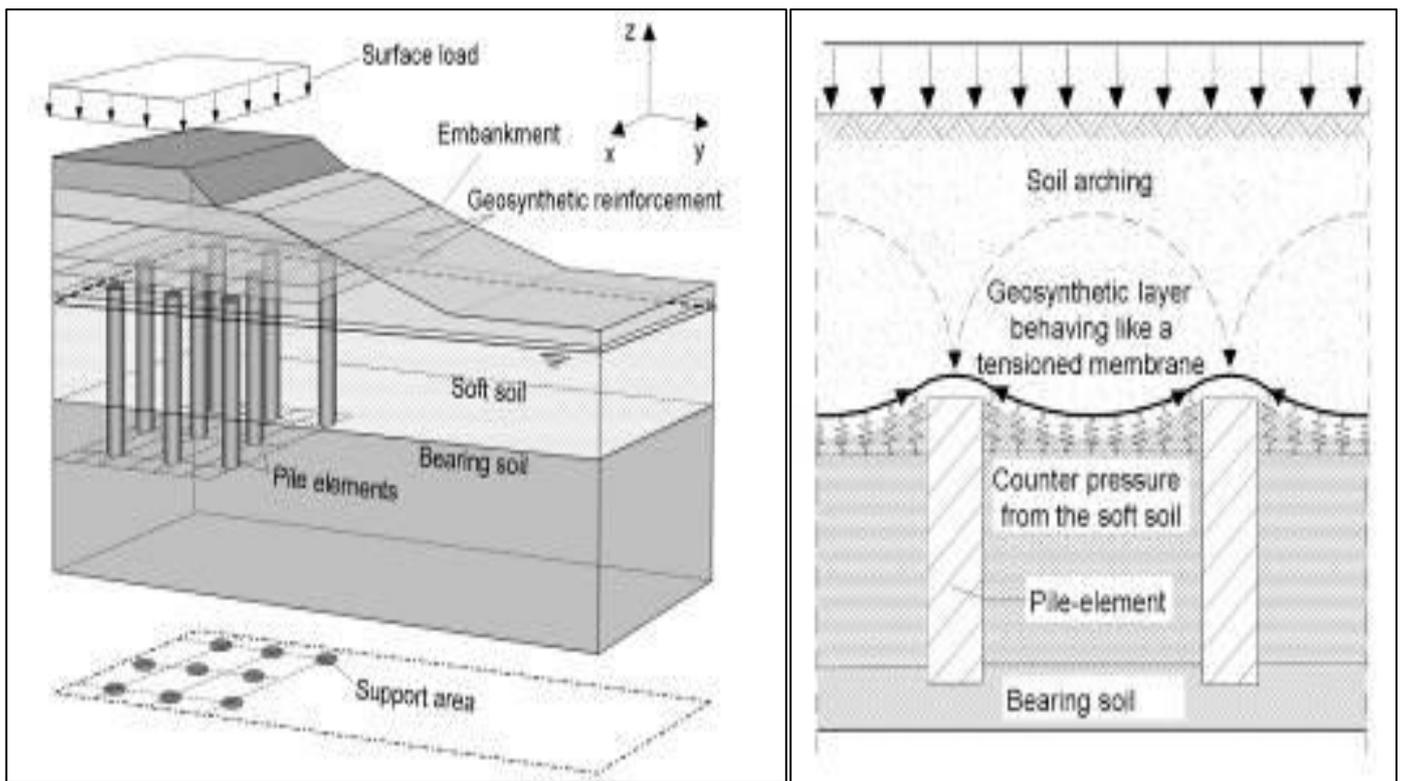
Geosynthetic-Reinforced and Pile-Supported Embankment (Clemente Fuggini et al 2016)
